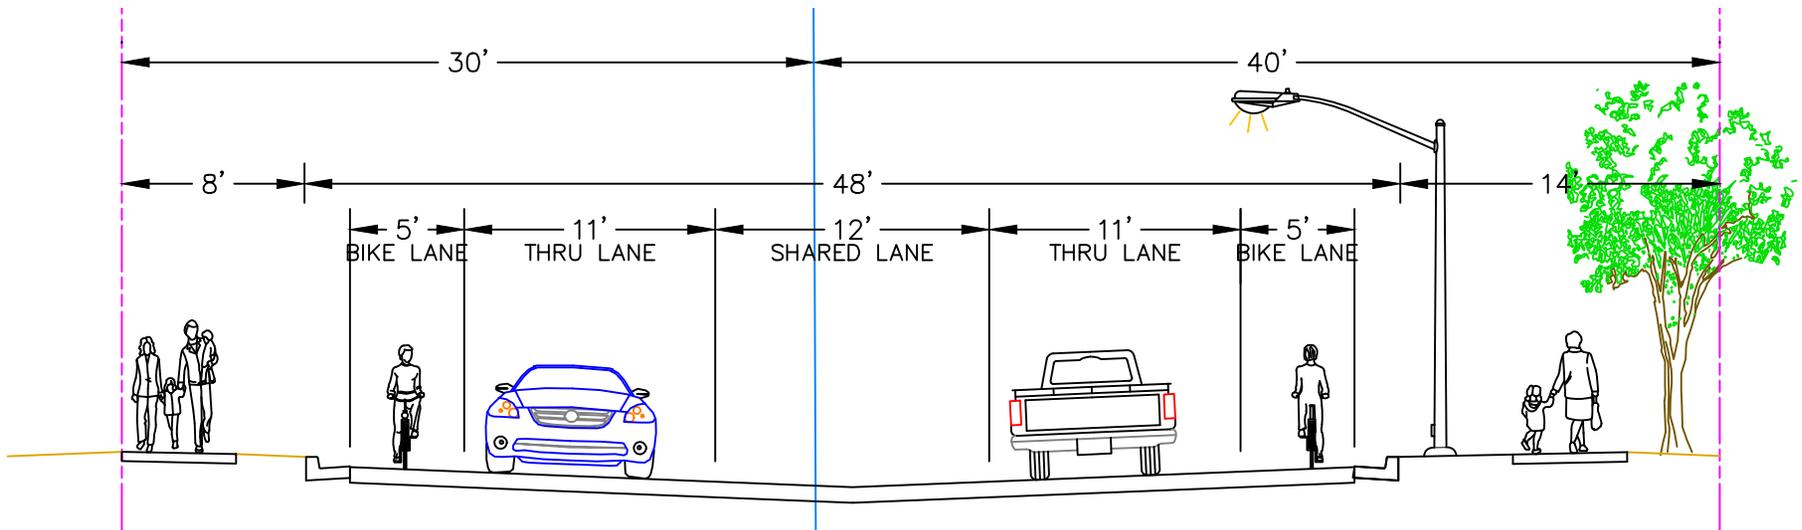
, Proposed Conditions: Detached Sidewalks, sidewalk ramps, curb & gutter, and bicycle lanes.
